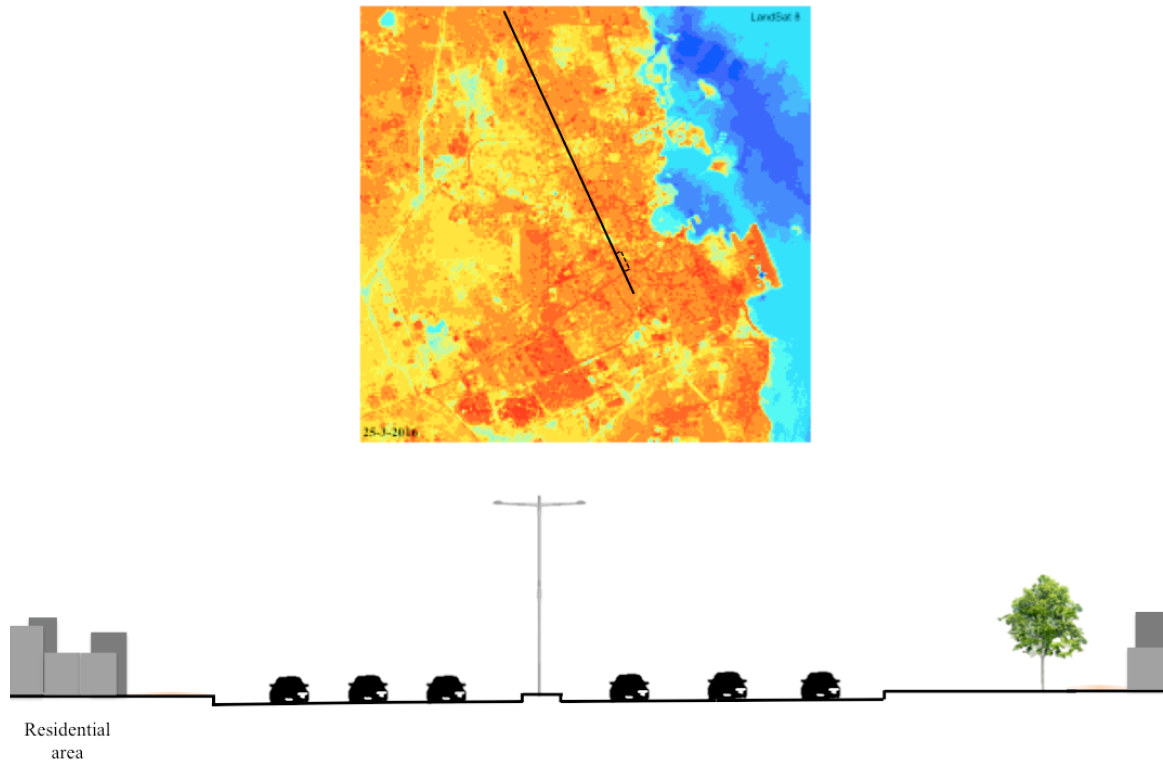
Al-Shamal Road cross-section, 2016 (Source: Author).
